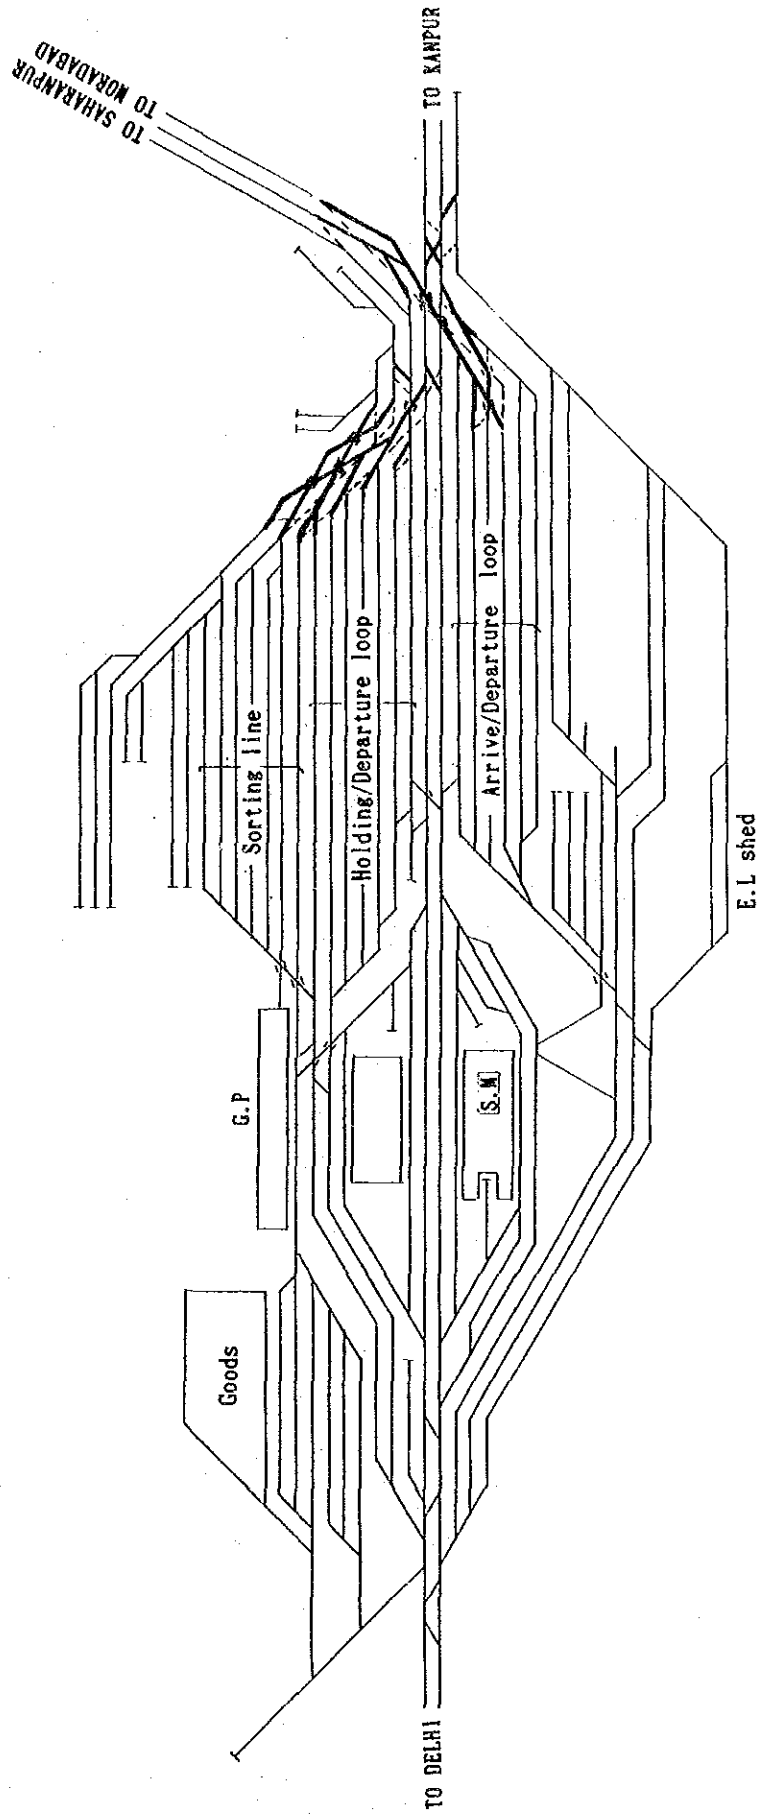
Haziabad Station Yard Improvement Plan
